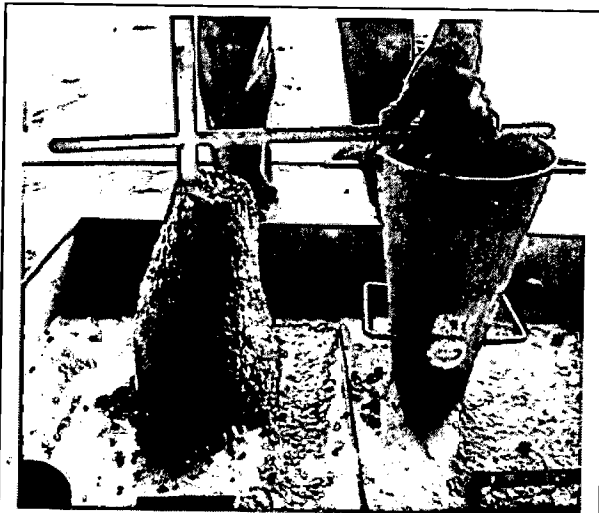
Slump of concrete POFA originally taken from palm oil mill
